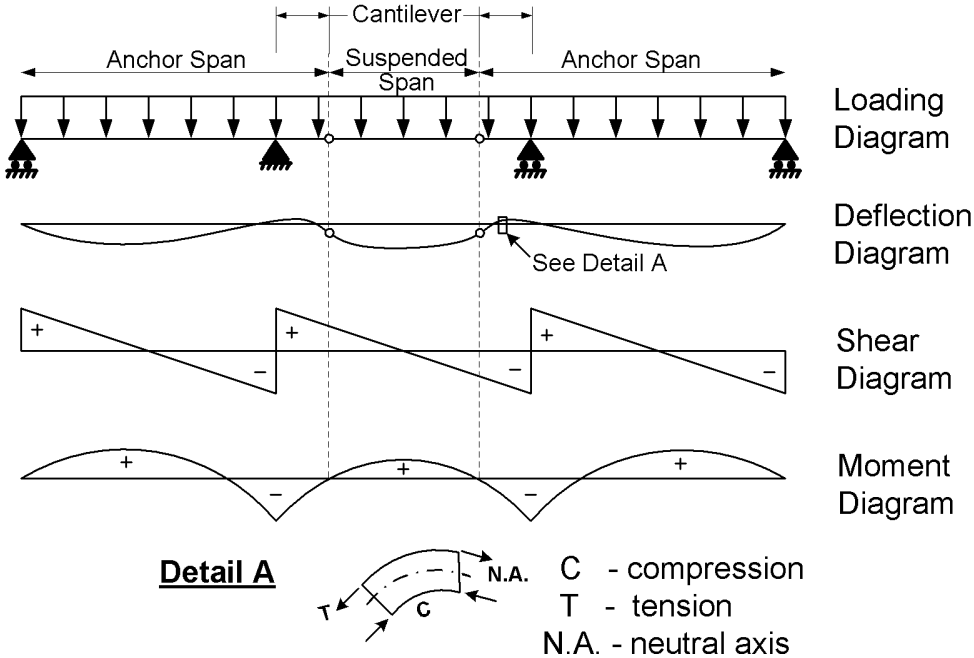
Cantilever Span Extension of a Continuous Span
